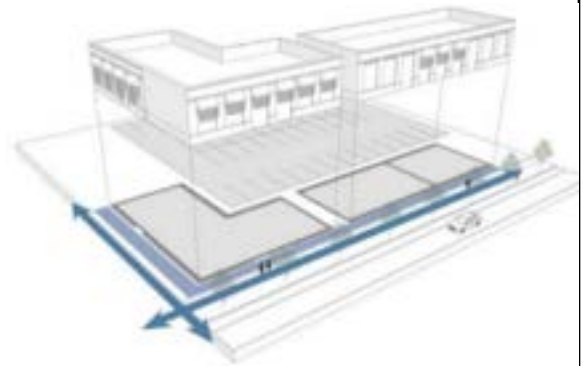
Street Corner – Acknowledge corner sites and multiple frontages
